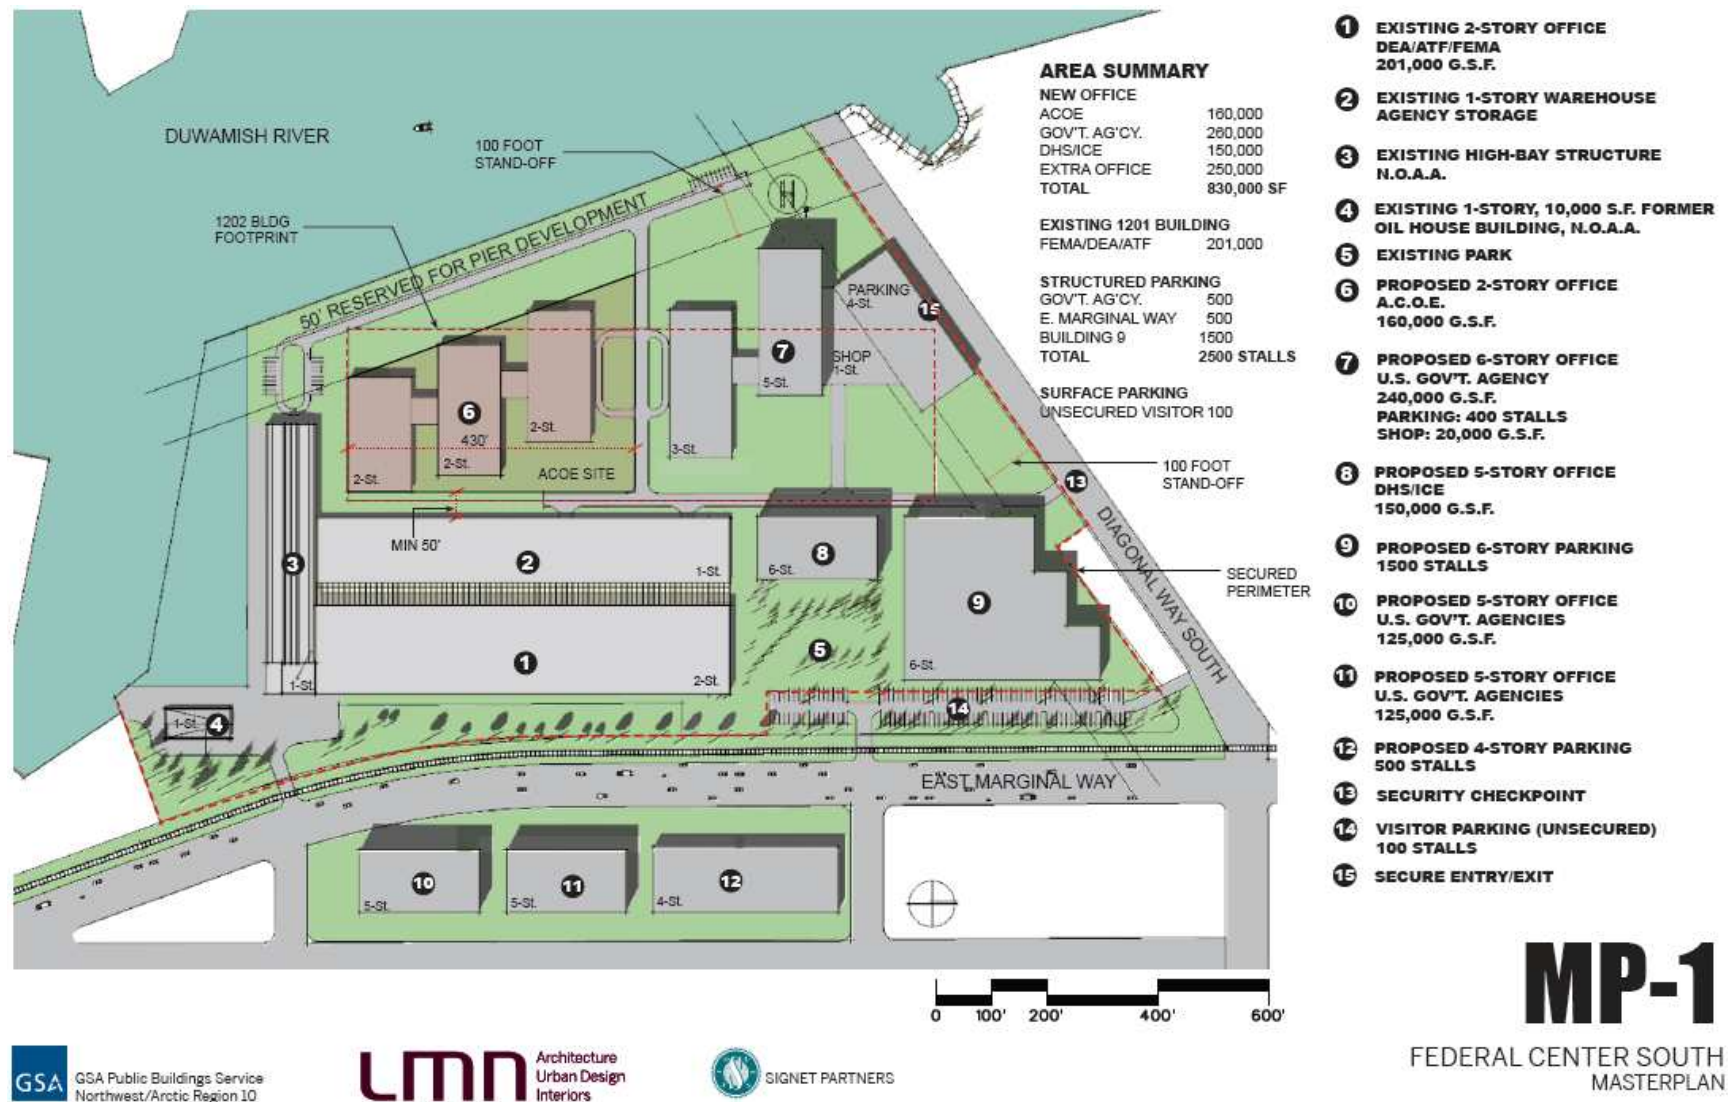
Conceptual Master Site Plan for the Federal Central South Complex
